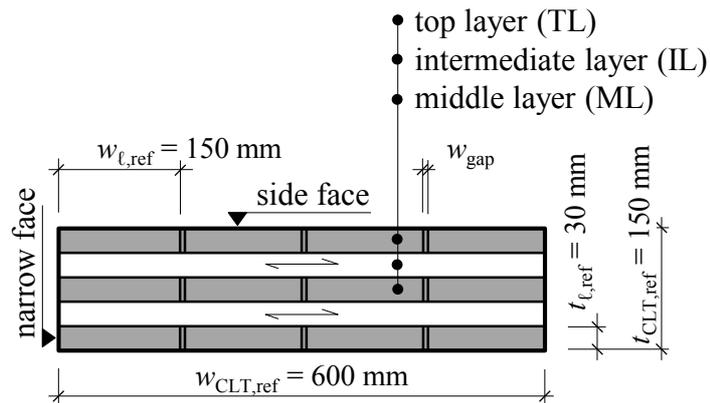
Reference cross-section of a CLT element and relevant terms.
